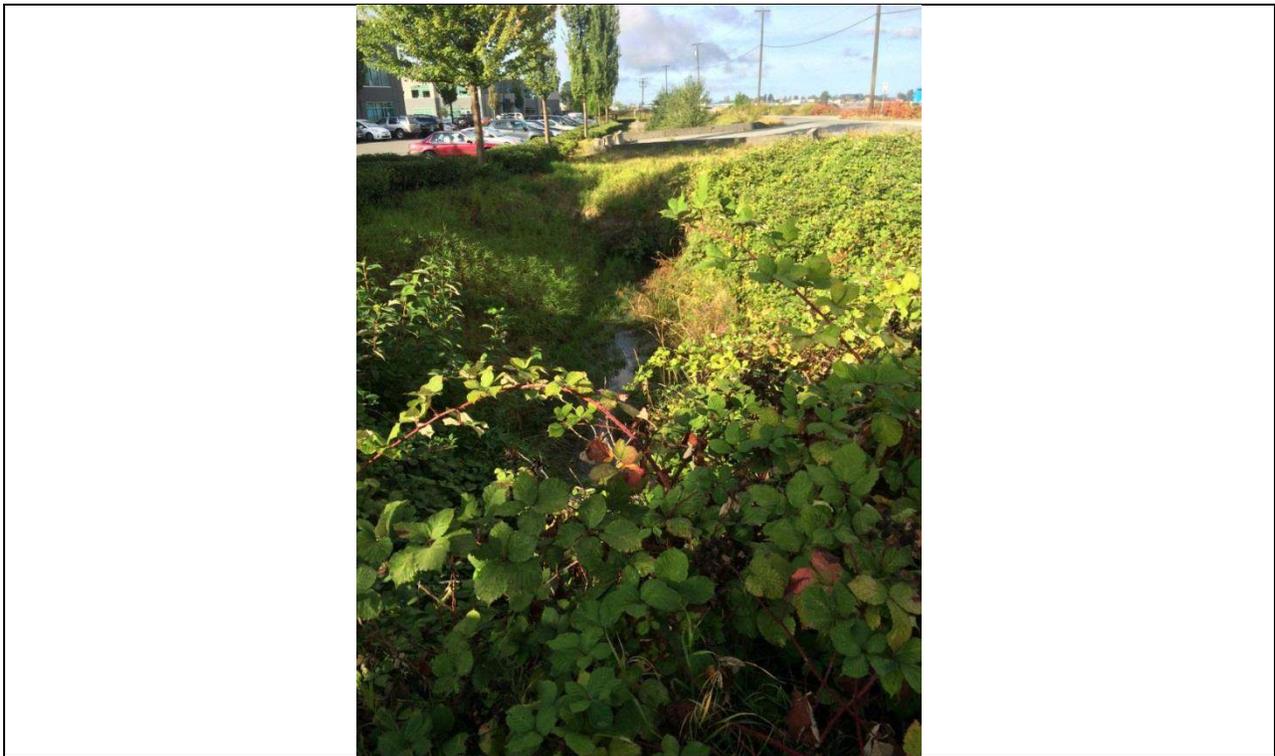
Ditch treatment of adjoining property to the west, looking west from southern lot
